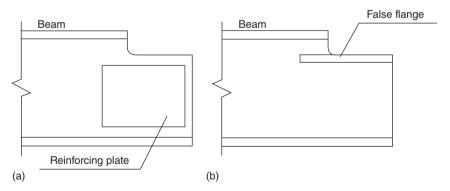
(a) Reinforcing plate and (b) false flange.
